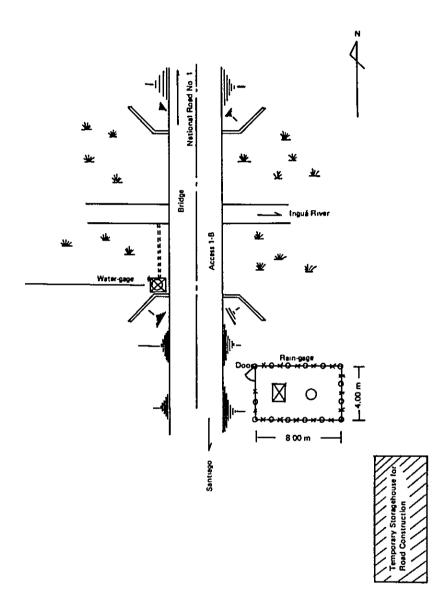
Location of Water Gage Installation at the Inguá River
